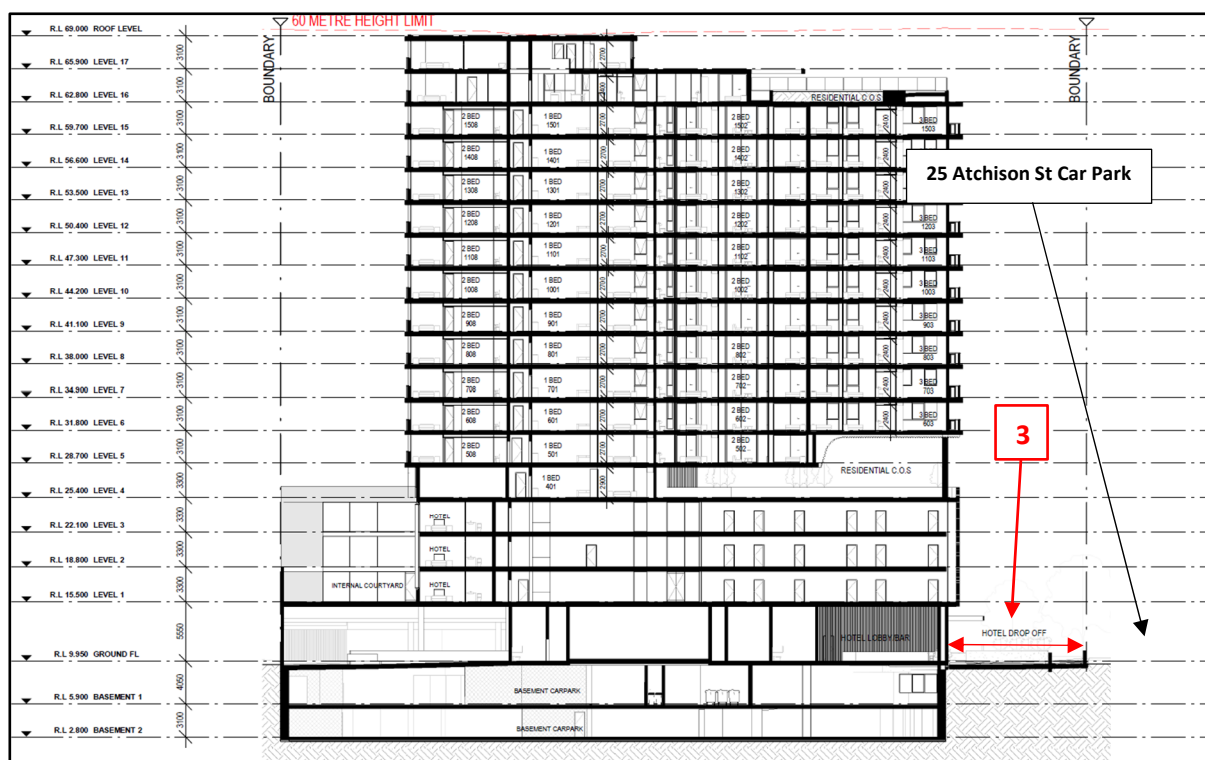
NORTH-SOUTH PROFILE SECTION (DWA)
